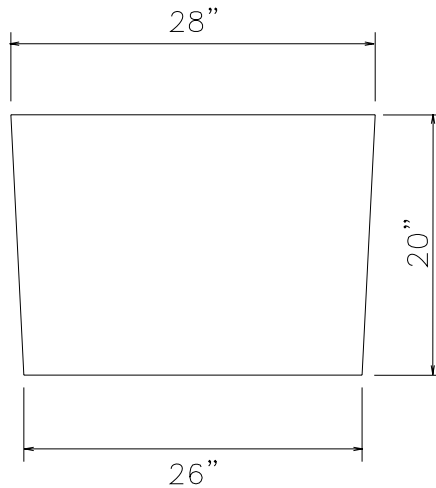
Cross-Section of Low-Profile Barrier Segment.
